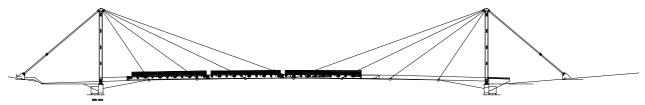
Three connected bridge deck parts during launching and in position to connect the forth part.
